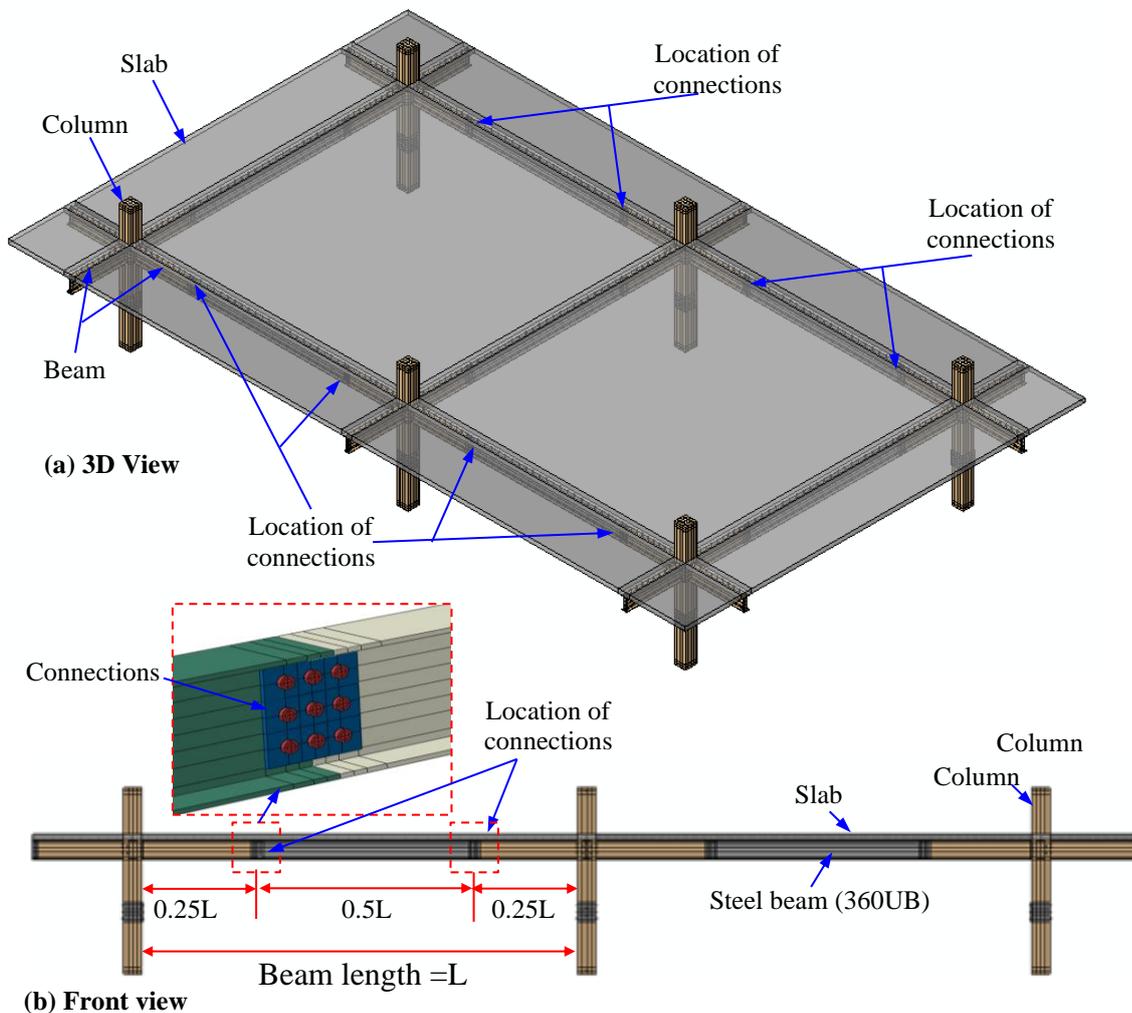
Location of beam-to-beam connections for prefabricated composite structures
